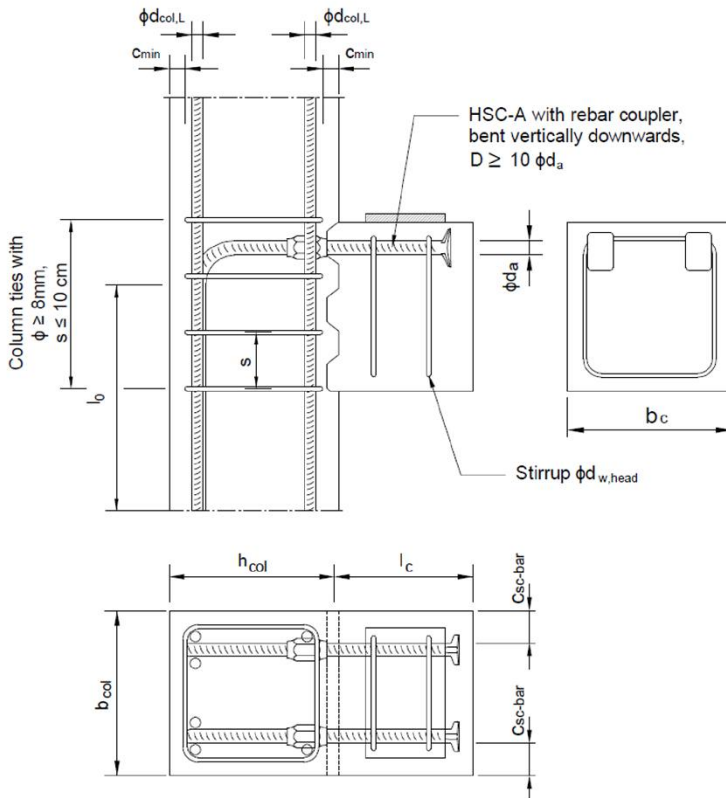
Dimensioning and detailing of corbel-column-joints with casting segment
